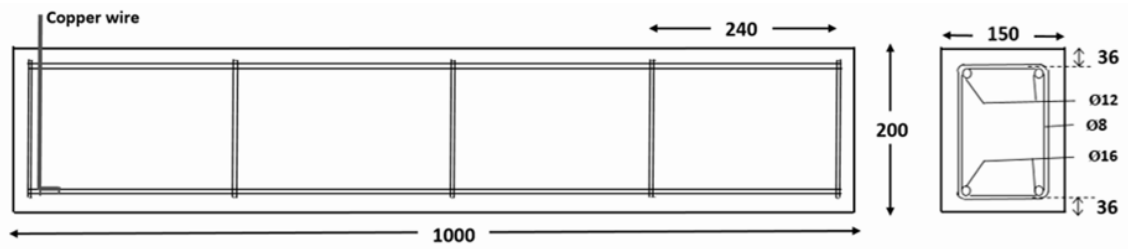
2: Details of beam specimen of experiment 1 (units are in mm)
